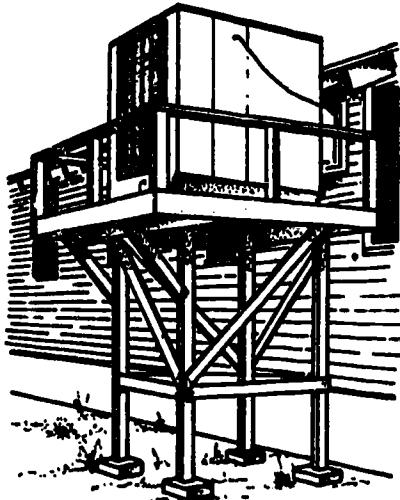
Large evaporative cooler mounted on self-supporting platform.
